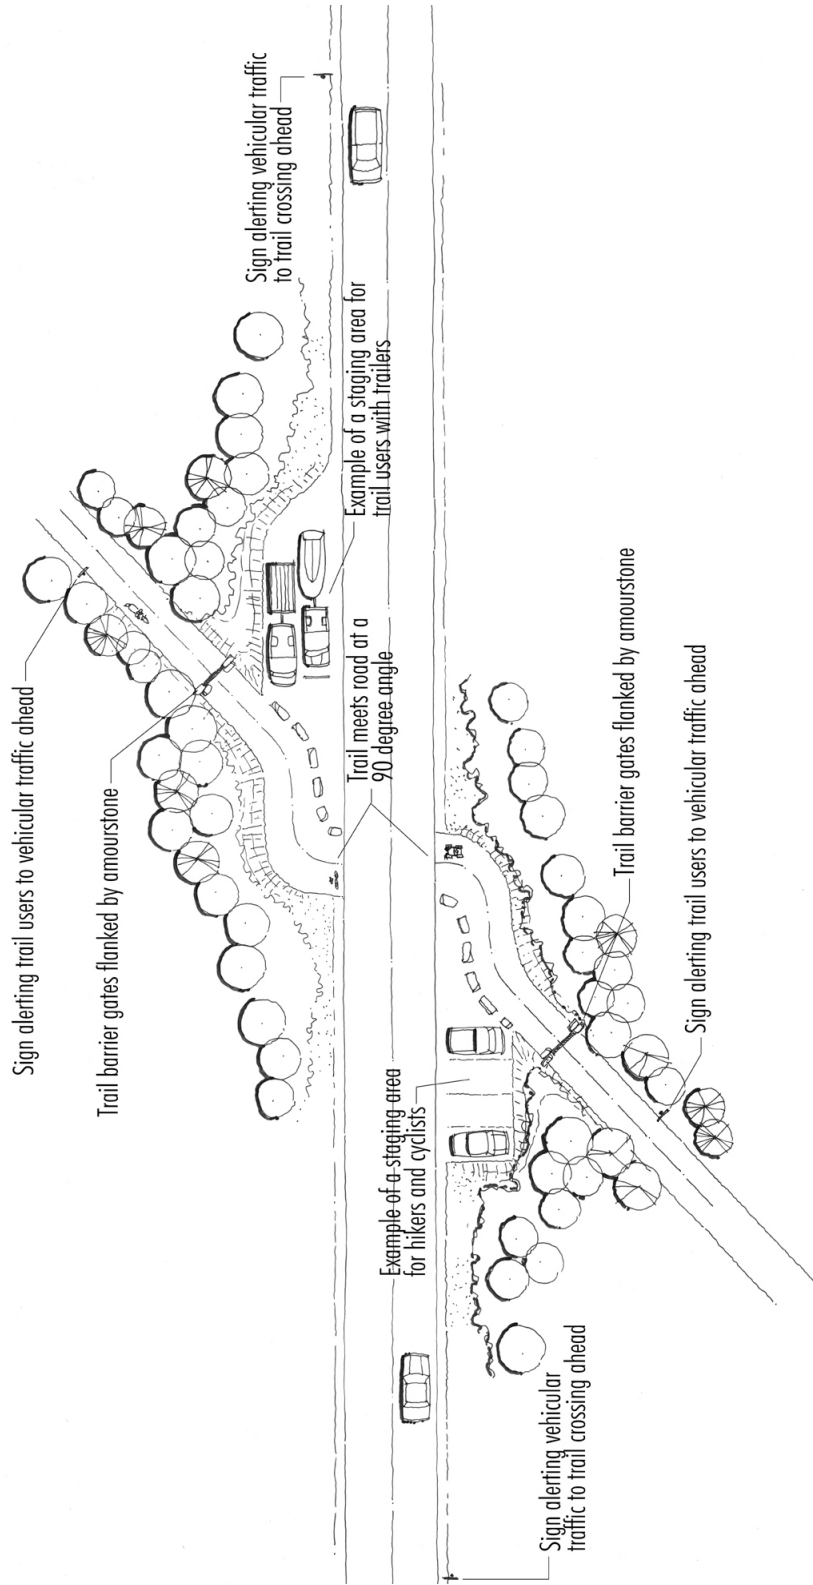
Example of a possible Trailhead Layout at a road intersection
